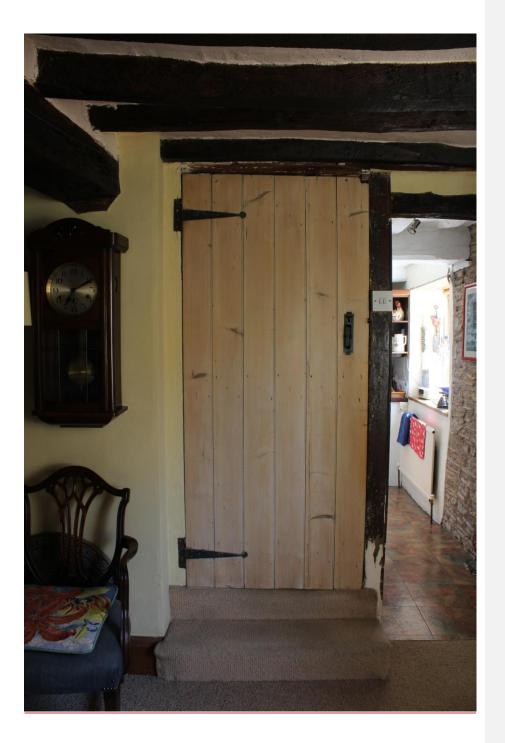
Stair door at 6 Westfield Lane. Looking east.
